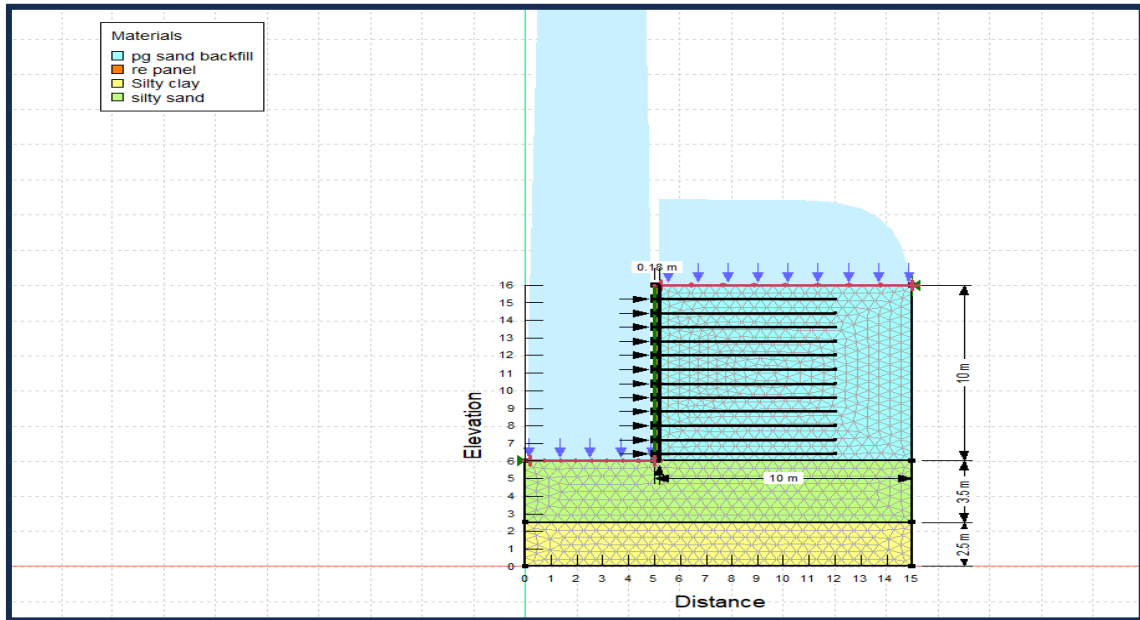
Geometry of study of Reinforced Soil Wall with Geo-Synthetic reinforcement (0.7H)
